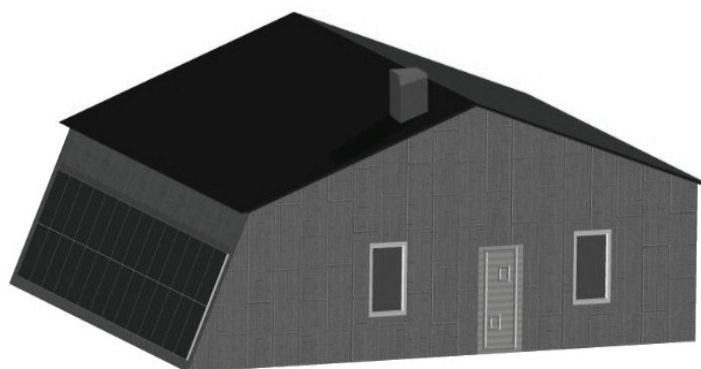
An example of a building with a PV façade installation mounted at the tilt angle of 75° and facing south
